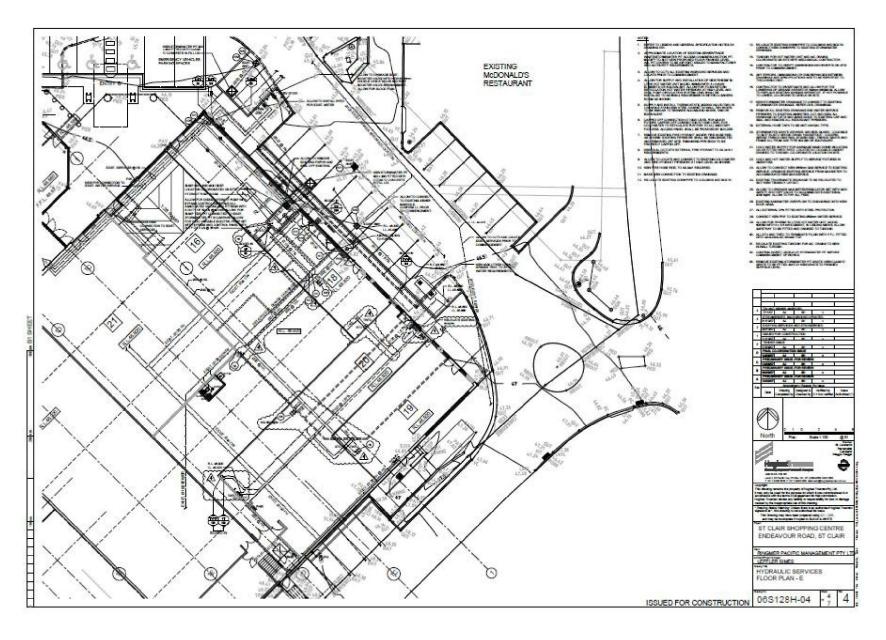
shows the hydraulic site plan for Shop 20 within the shopping centre.
